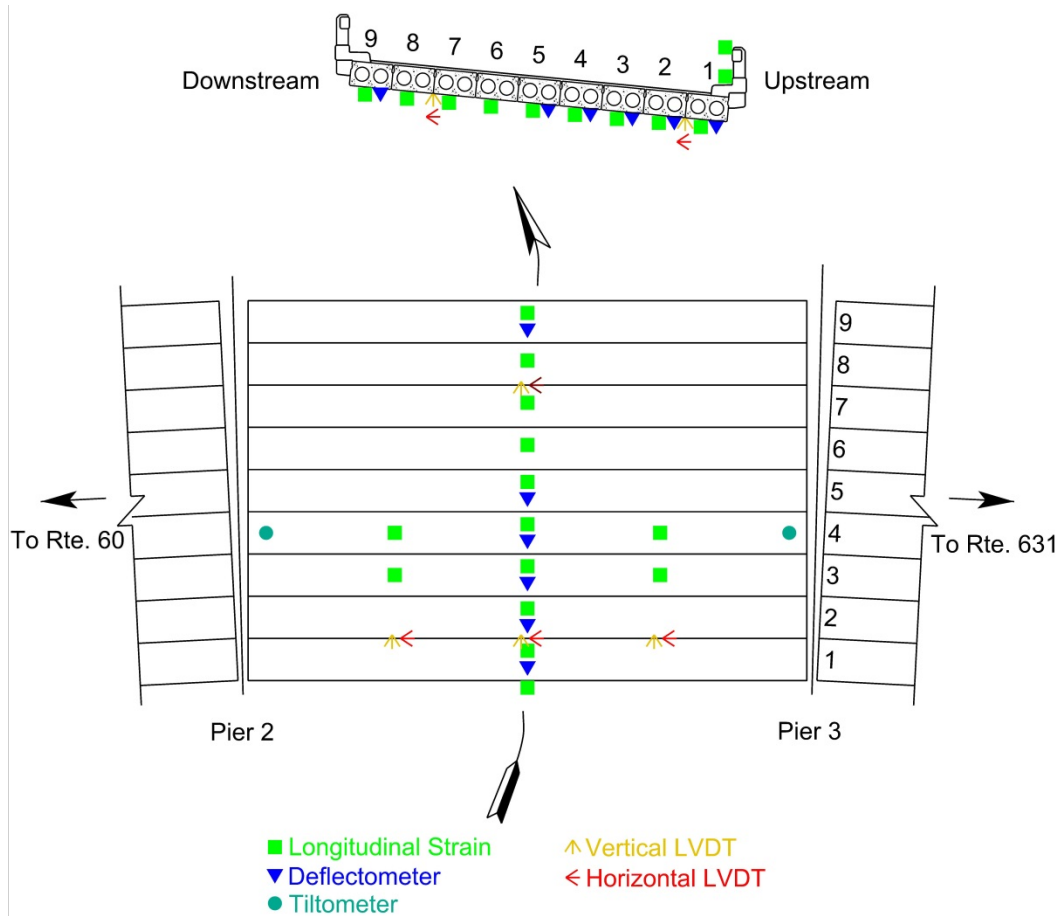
Instrumentation Plan for Live Load Test of Adkins Road Bridge. LVDT = linear variable differential transformer.
